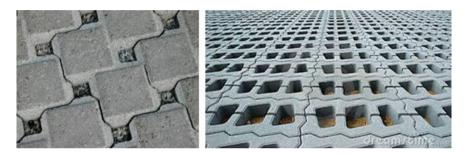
Different arrangement of PICP pavements for parking. *Image Courtesy* google.co.in and perviousconcrete.org
